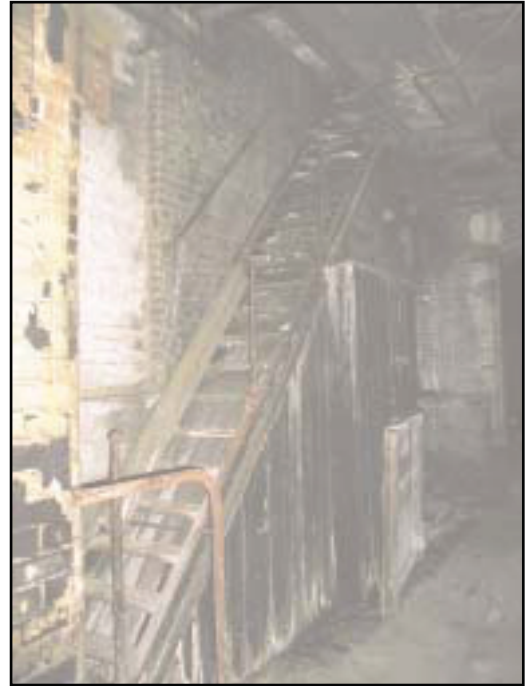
The Electric Lighting Station Gatehouse, Stairway Access from Ground to 1st Floor
